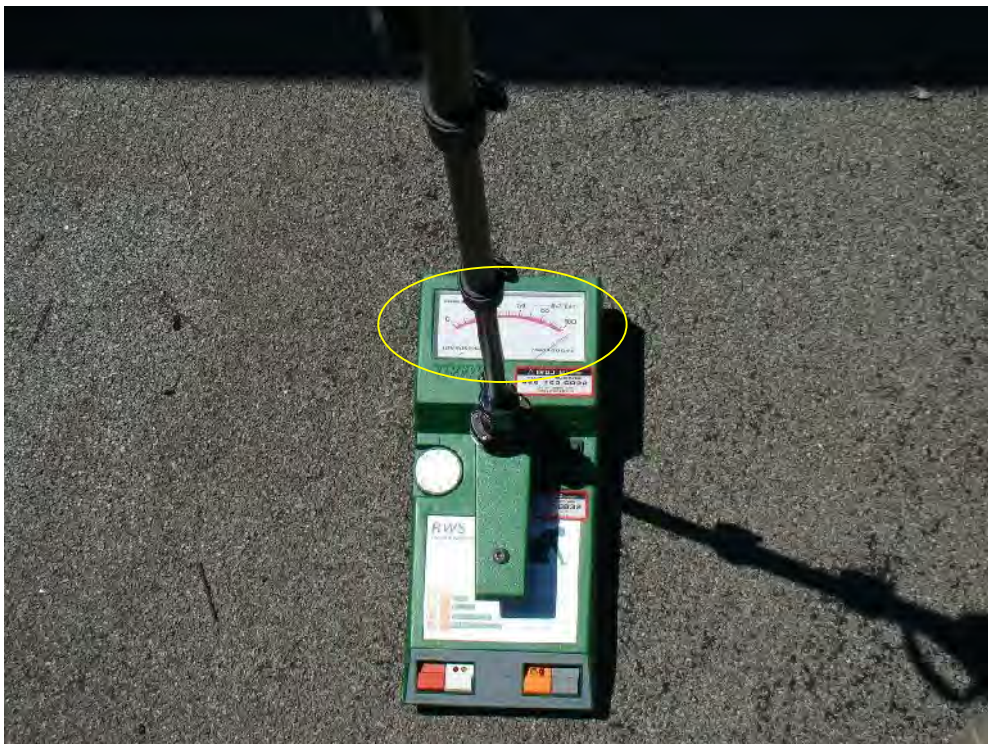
Roof Area 3.1 – This roof is situated over the upper mechanical room and consists of a modified bitumen membrane system installed in the early to mid 1990's.
